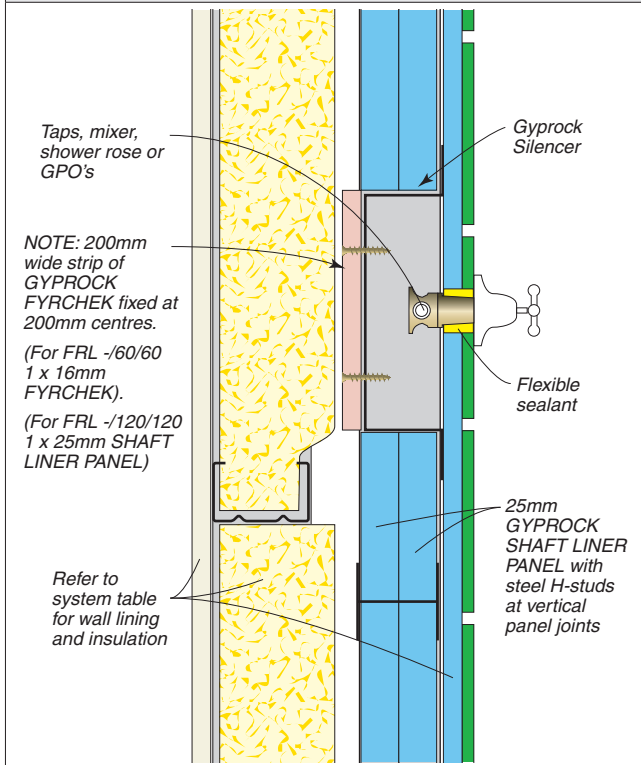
PLUMBING SERVICES IN STUD WALL ONE SIDE (FRL -/120/120)
